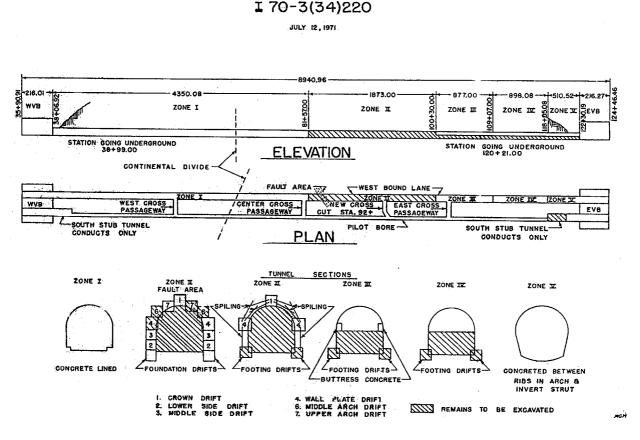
Elevation plans and profile for tunneling of the Straight Creek Tunnel.
